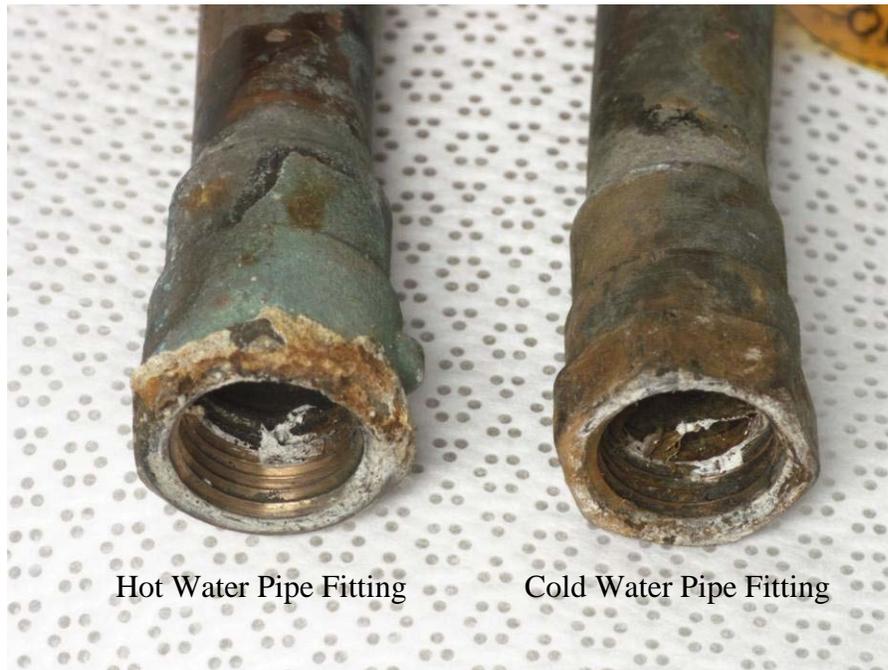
Hot Water and Cold Water Pipe Fittings Removed from Building 5 Plumbing System
